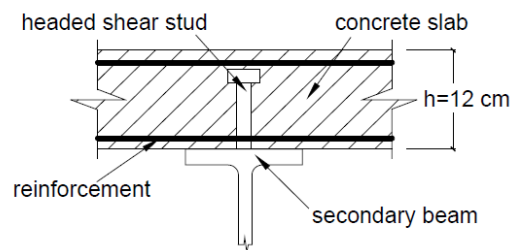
Shear stud connection in concrete-steel composite (Dinu, et al., 2013)
